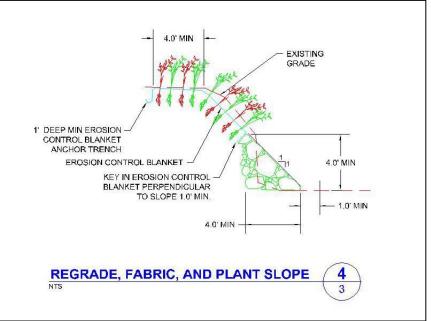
Standard drawing of slope reshape, planting and toe protection (drawing provided by Intuition and Logic)
